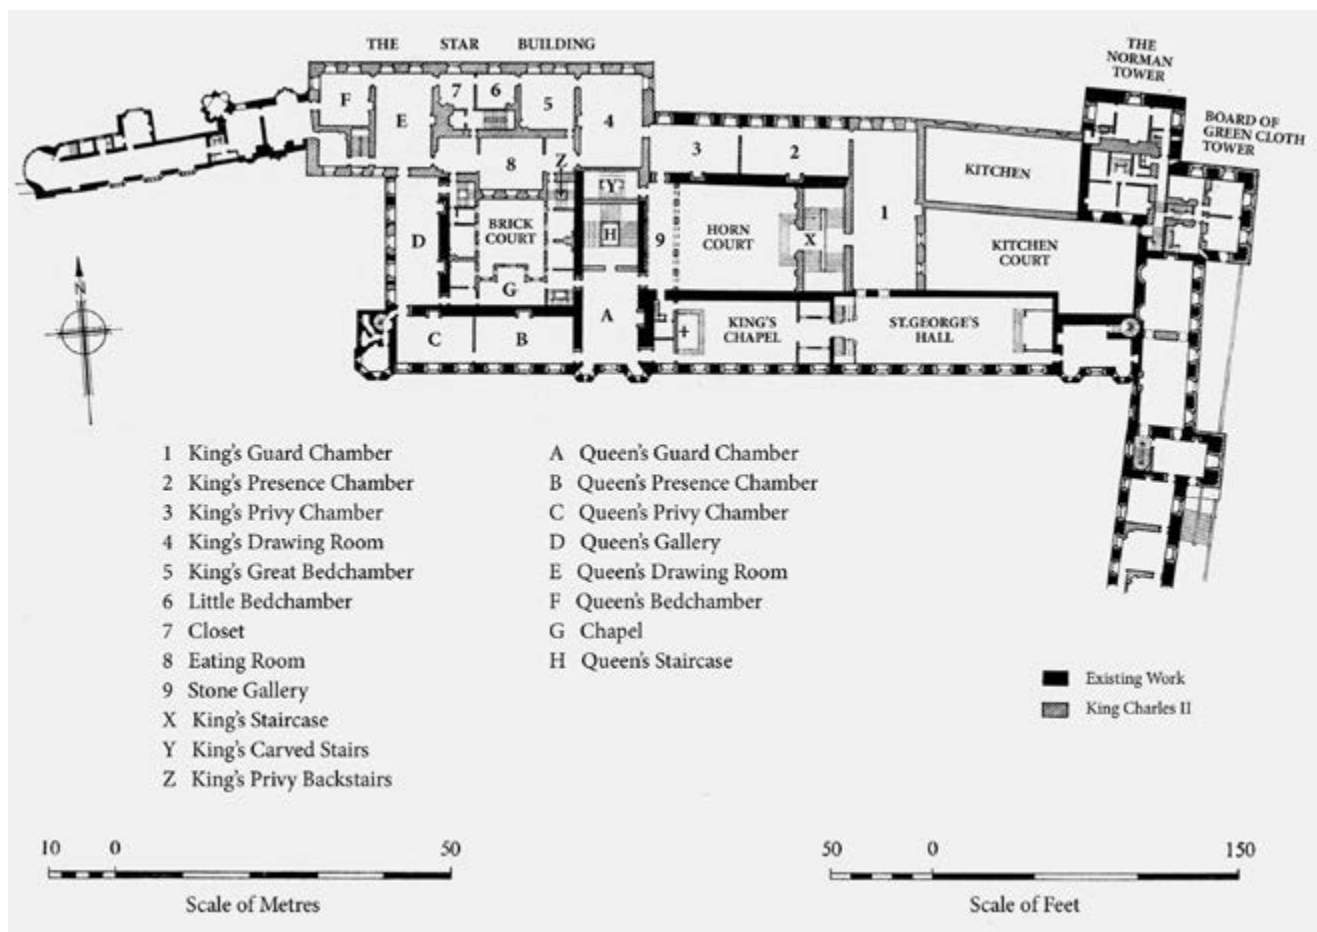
Plan of the first floor of Windsor Castle. From Colvin et al. 1976, 319 (with additional labelling by CS)
